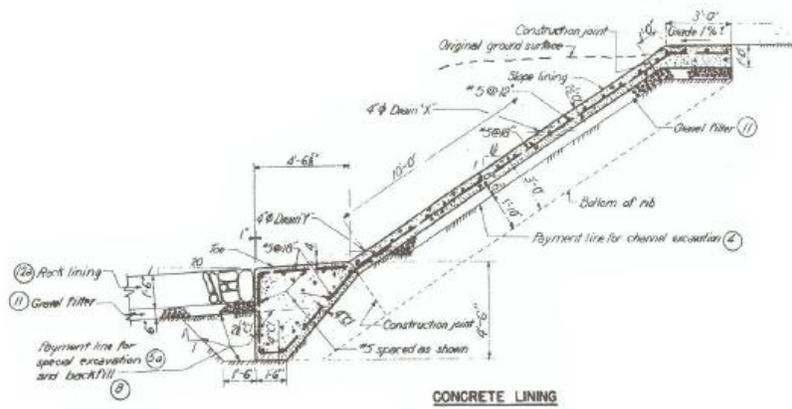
1 Concrete Lining (Bradford Flood Protection Project, Unit Three Tunungwant Creek, 1961)
